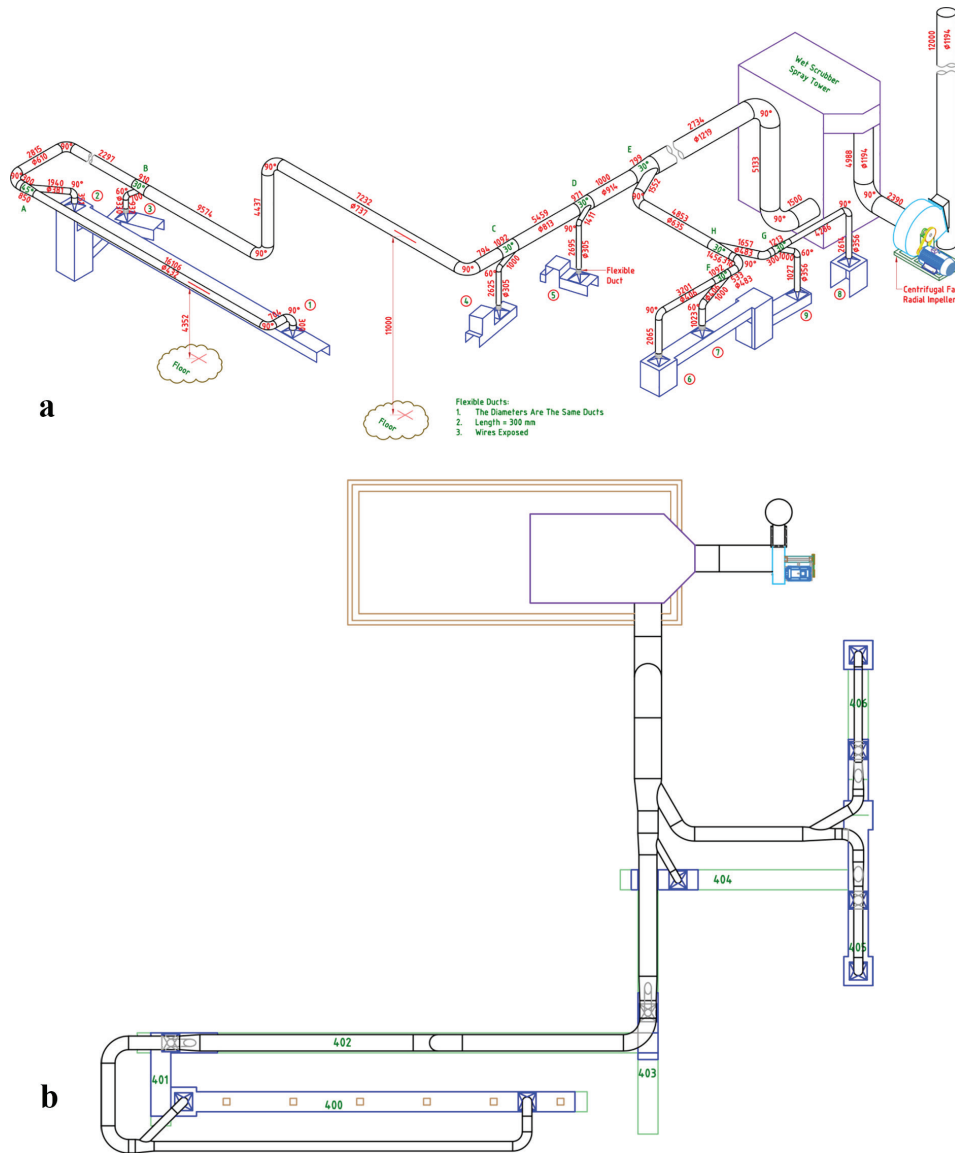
a) Location and arrangement of local exhaust ventilation system, b) Horizontal plan of the designed local exhaust ventilation system
